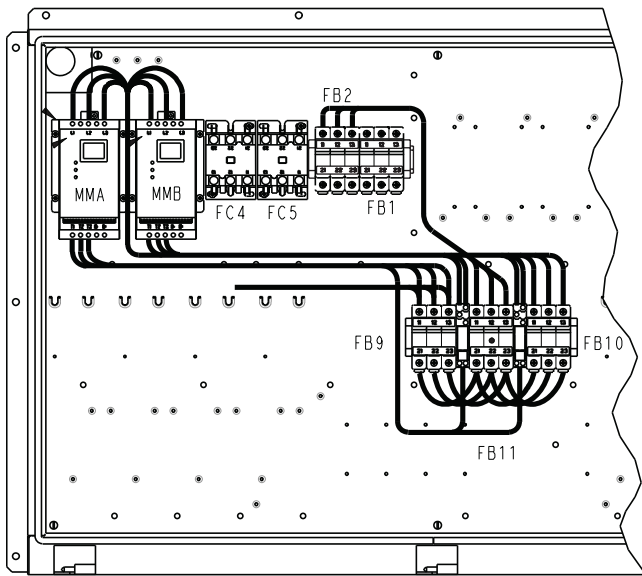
Motormaster® V Installation Location — 38APD070-100 Units (High SCCR Unit Shown)
